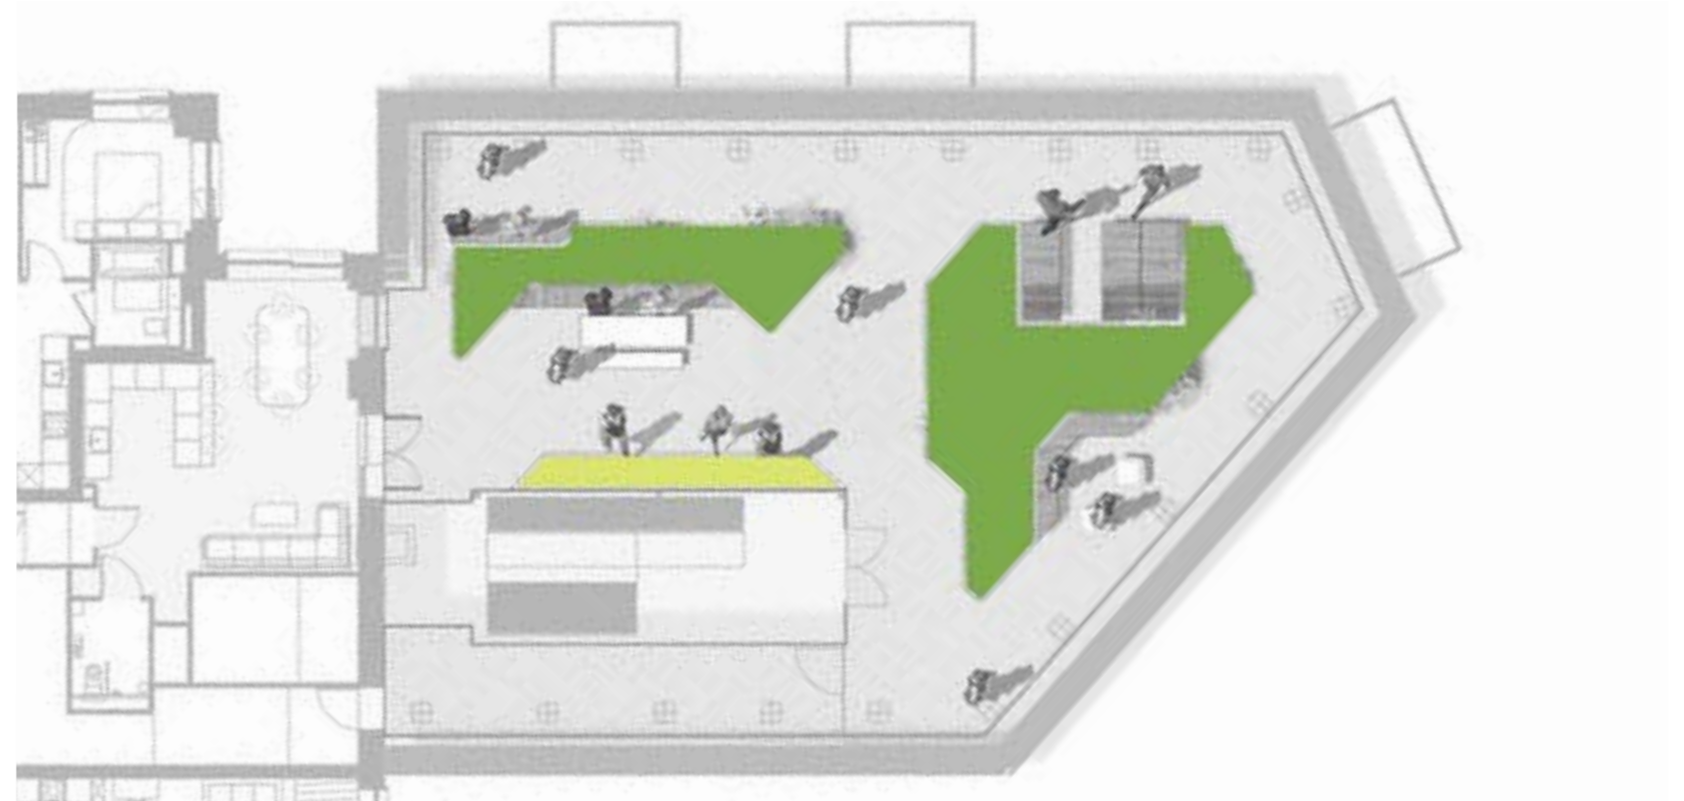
Diagram illustrating proposed planting strategy at N18 Roof Terrace
